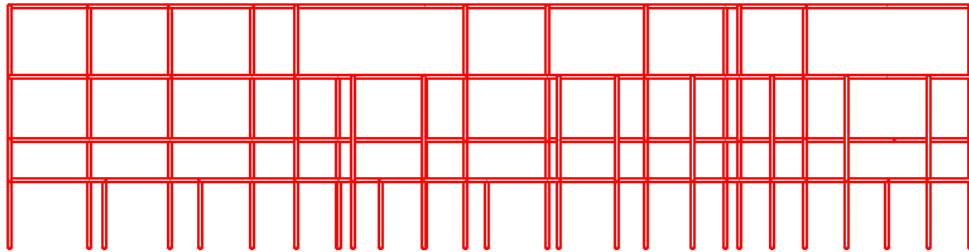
Side View Showing All Columns of the Administrative Building.
